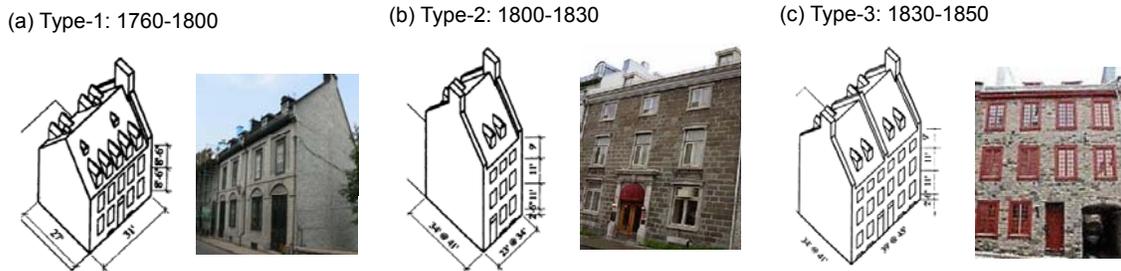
Typical stone masonry buildings present in the Old Quebec City according to year of construction: a) 1760-1800, b) 1800-1830, and c) 1830-1850.
